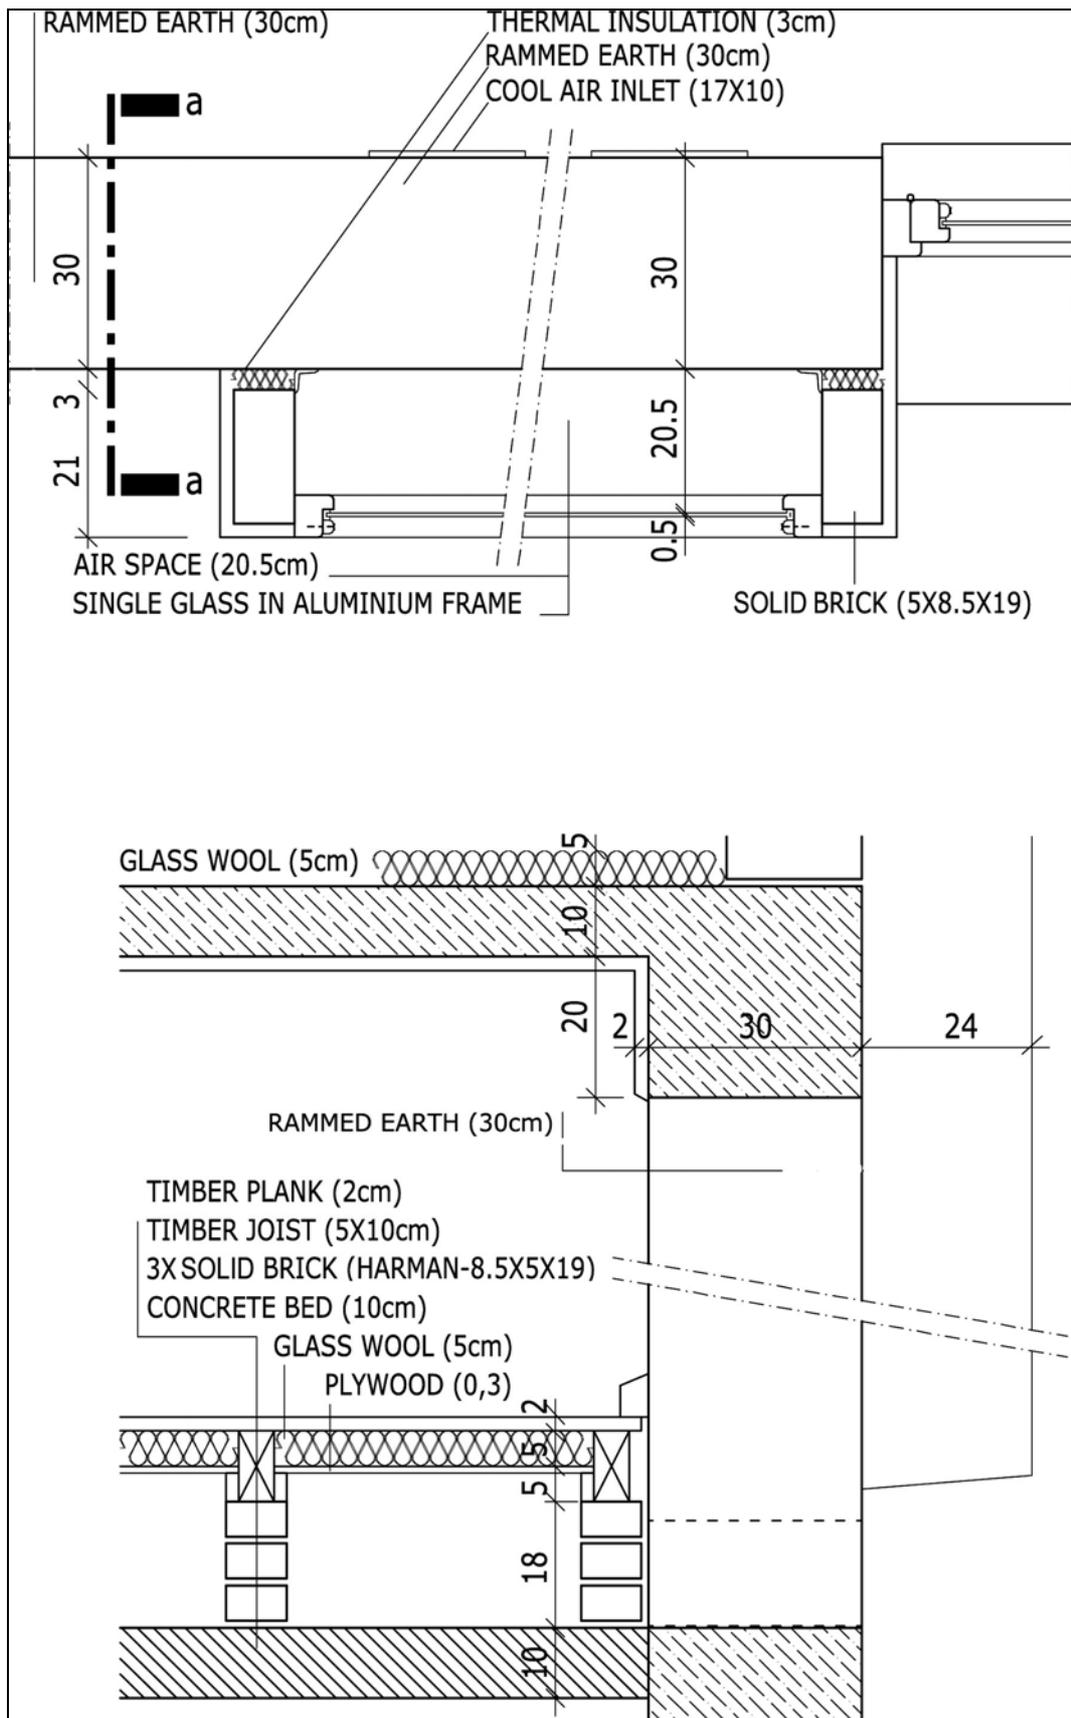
Construction with indigenous material—rammed earth: plan indicates the detail of rammed earth Trombe Wall of the sample dwelling. Wall section in the second detail explains how the earth wall combines with the suspended ground floor and the reinforced concrete beam of the floor of the roof; Scale 1/10
